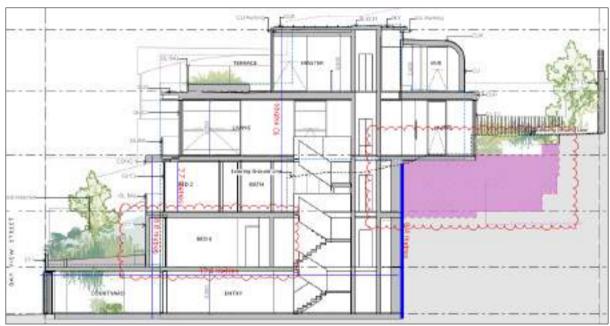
Maximum excavation proposed on site is 8.4m (marked as blue line) for the lift and vapour cavity
